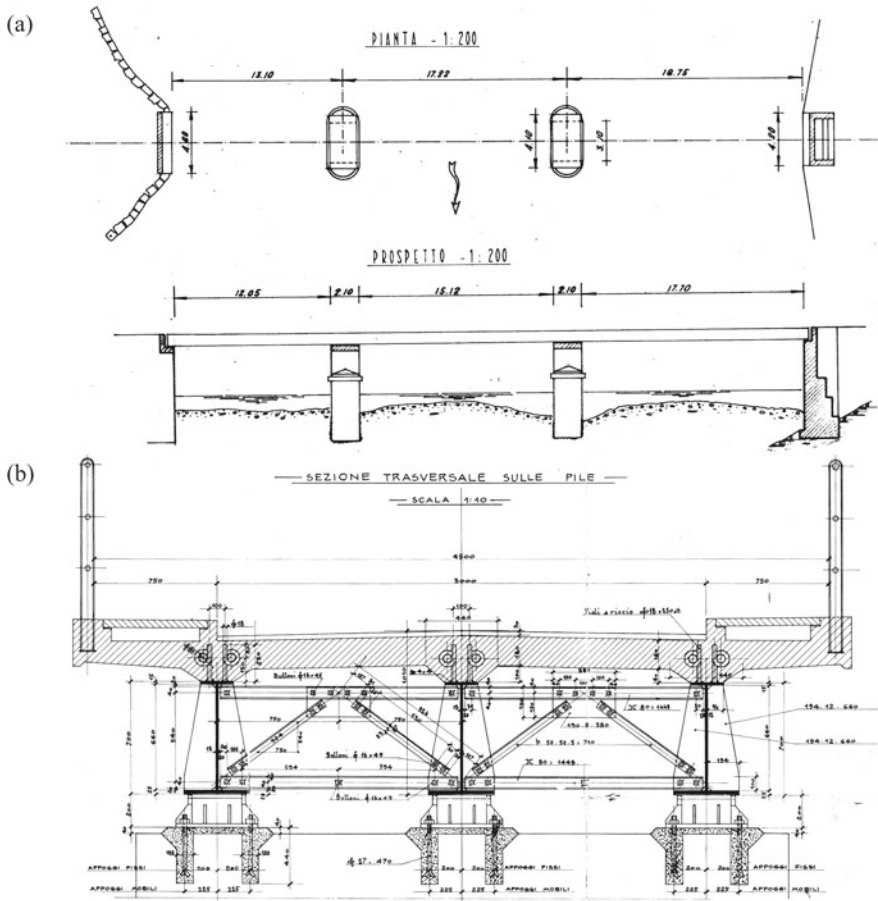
Original blueprints of Baghetto bridge: a plan and longitudinal section; b detail of the steel-concrete composite deck
